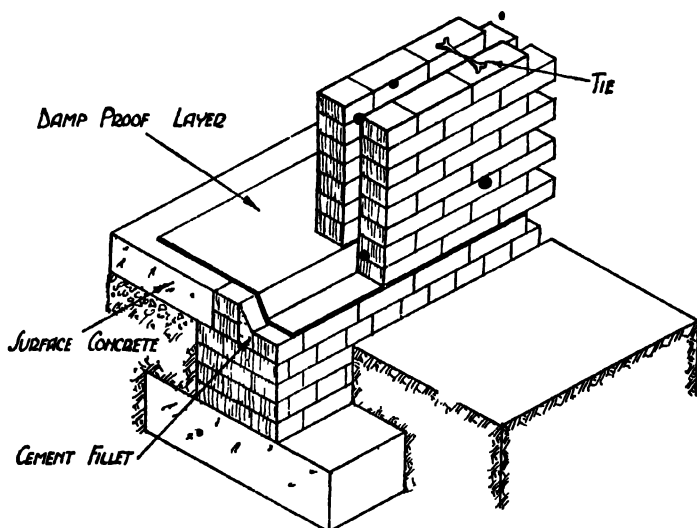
DAMP PROOF COURSE IN CAVITY WALL
